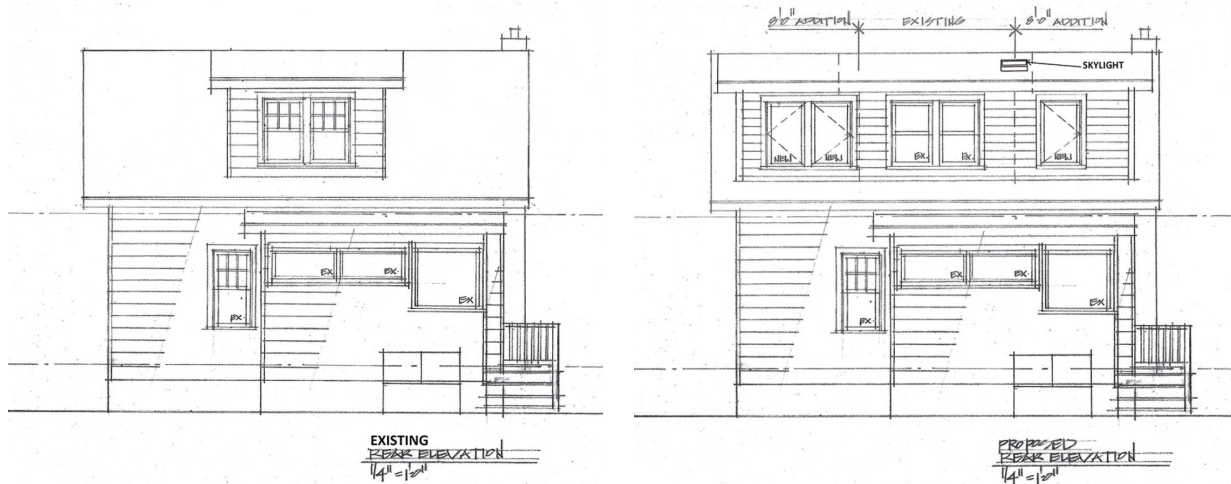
Existing rear (left) and proposed rear (right) elevation.
